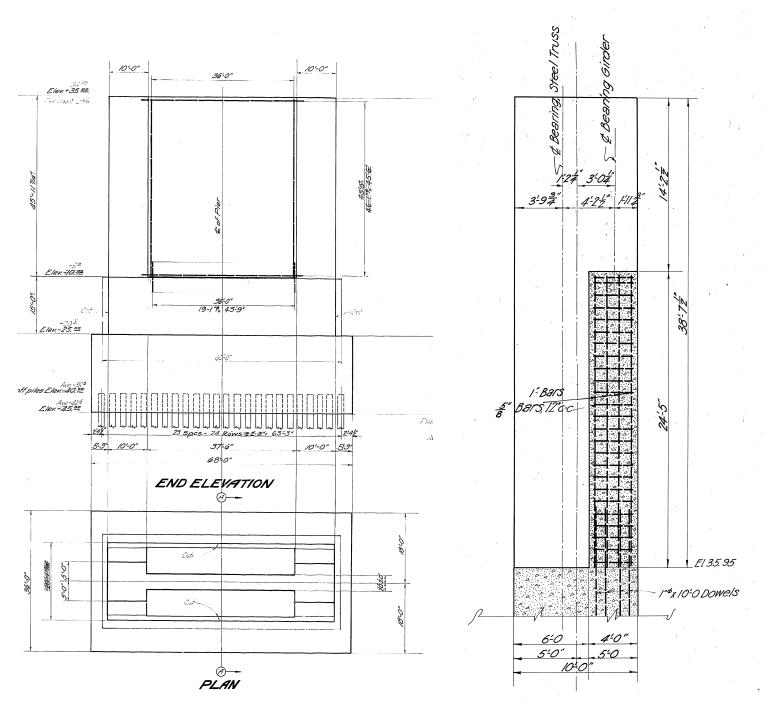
Burnside Bridge Fixed Spans Piers 1 & 4, foundation piles (outer piles) in uplift, in bridge longitudinal direction
